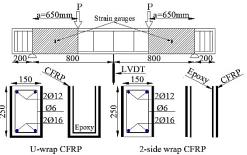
Test specimen reinforcement configuration and schematic of strengthening schemes
